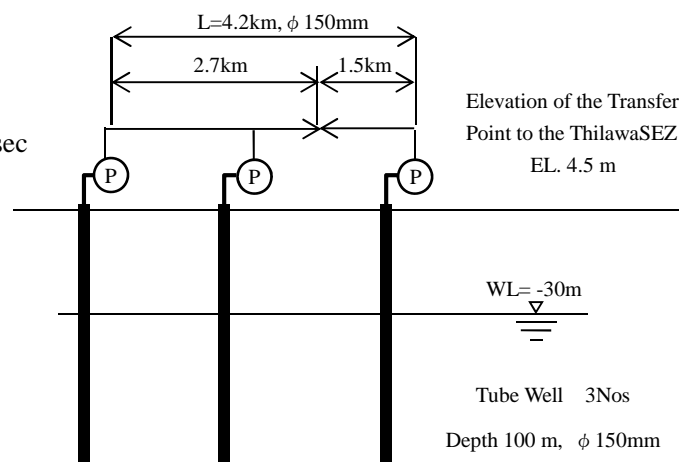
Layout Drawing of Tube Wells in Thilawa SEZ
